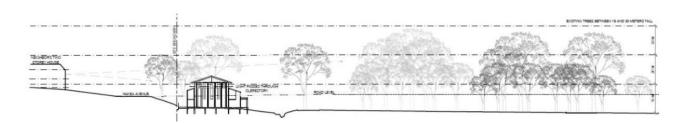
Plan showing the scale of the proposed chapel within the context of the local topography (Source: Architectural Plans, prepared by Hector Abrahams Architects)
